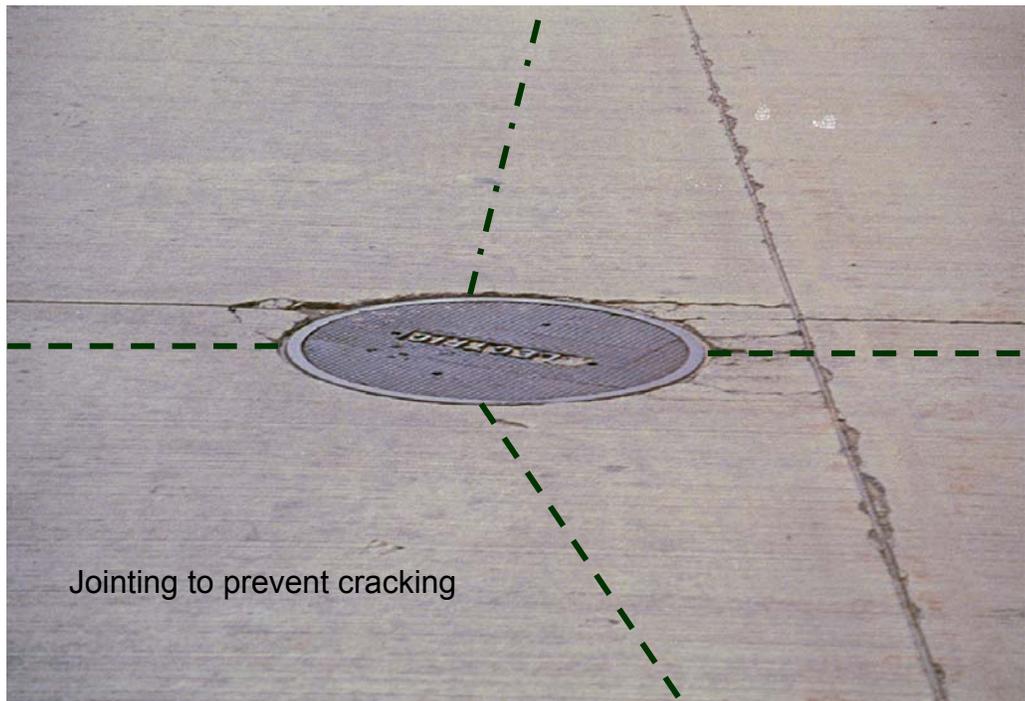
Jointing a manhole to eliminate cracking (Photo taken in Newport Rhode Island).
